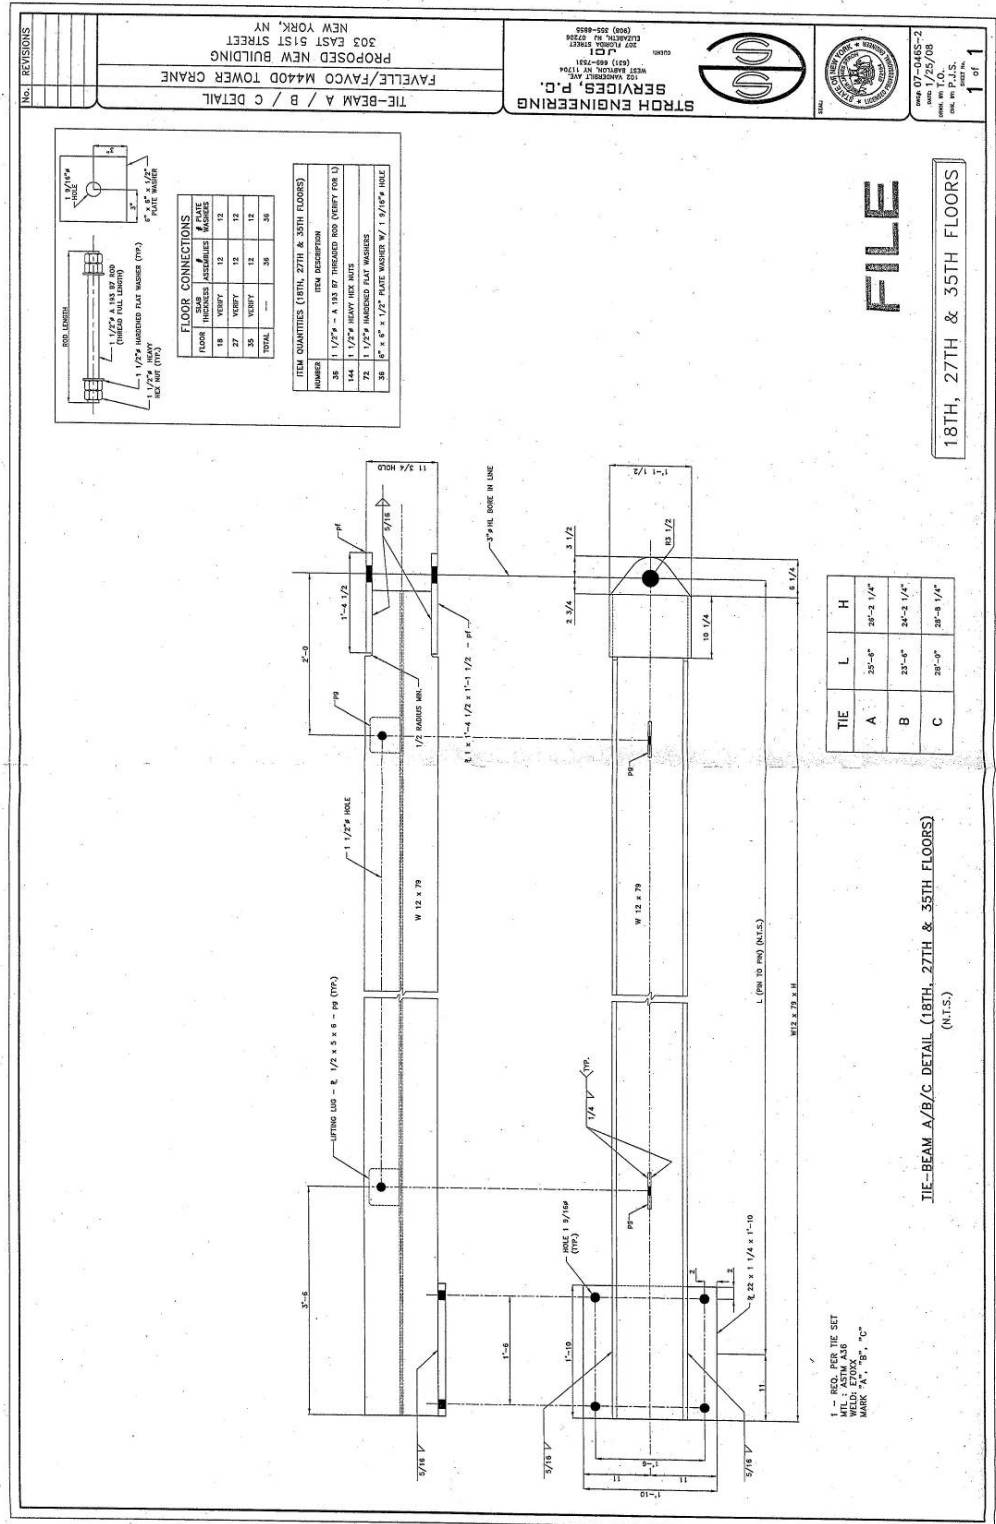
Tie-beam A / B / C Detail, Fabrication Drawing, by the crane engineer Stroh Engineering Services, P.C. Drawing 07-046S-2 Sheet 1 dated 1/25/08.
